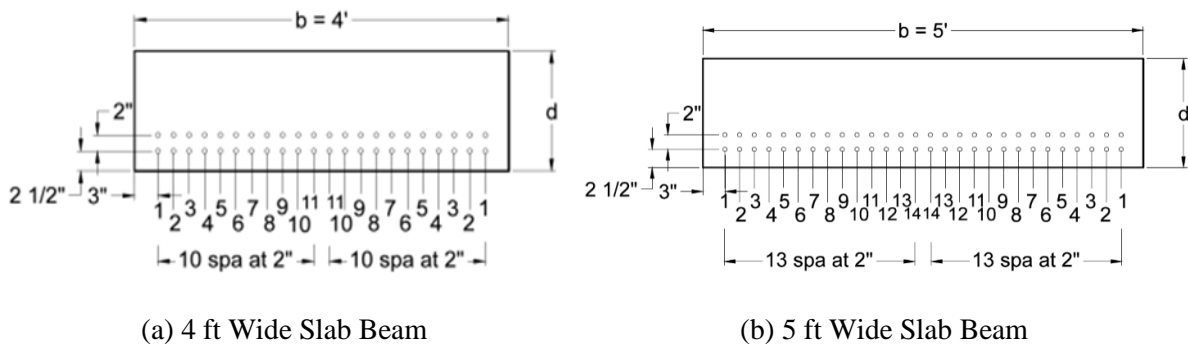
Section Geometry and Strand Details of Slab Beam Girders.
